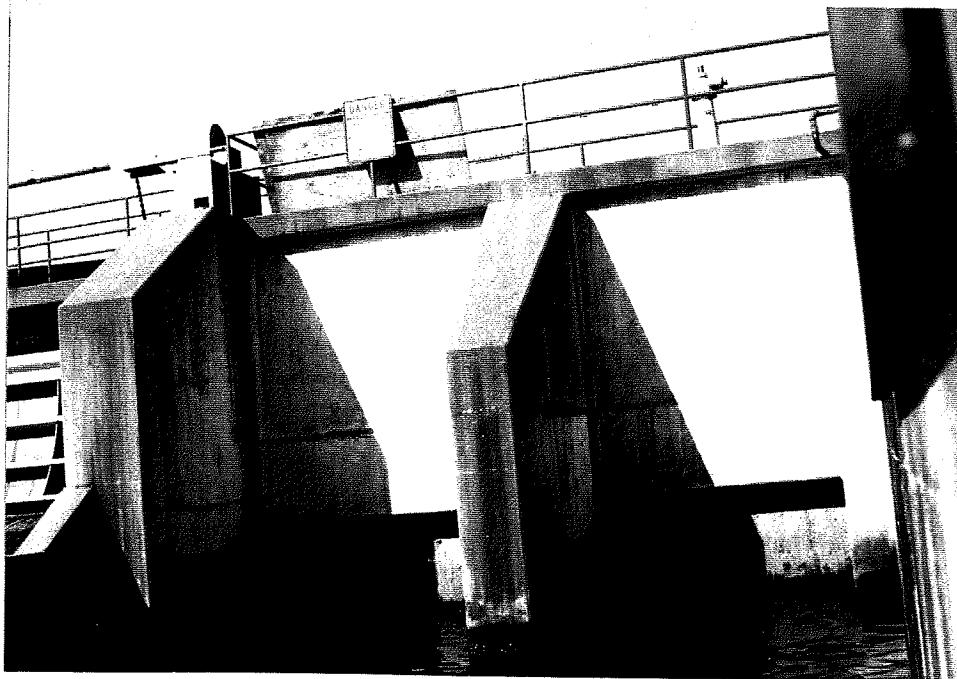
The two sluiceway bays on left side of dam. Vertical steel gates to control sluiceway openings at bottom of picture. Nov. '92
